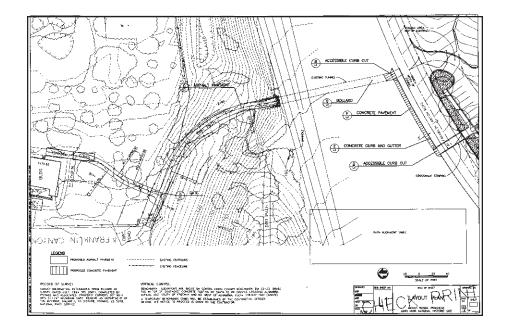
Plan from 1999 showing improvements to the California State Riding and Hiking Trail and a new pedestrian entrance. ("Layout Plan: Mt. Wanda Trailhead," John Muir National Historic Site, Sheet L-1, August 1999).
